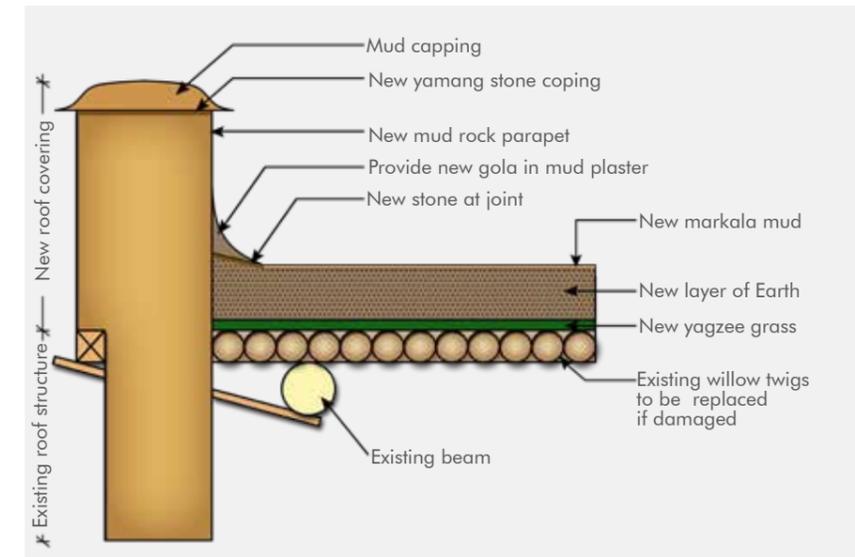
Detail of earthen roofing, Source: *Conserving Buddhist Monasteries: Ladakh, Bhawna Dandona, 2015
